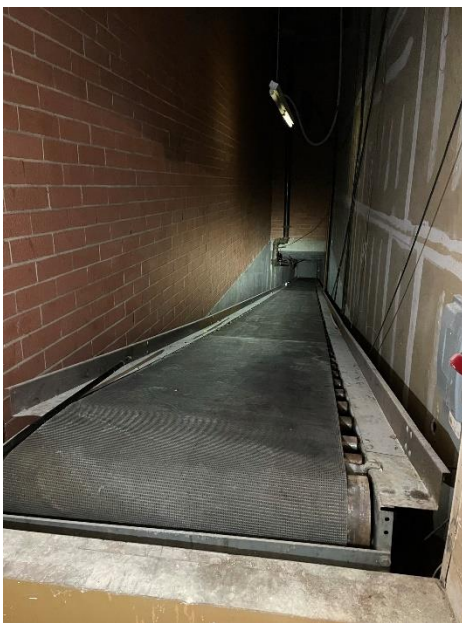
Former Sears Auto Center second floor elevator equipment room with minor staining on floor.
